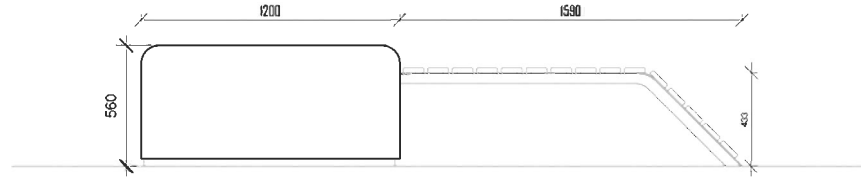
WAITING BENCH AND BULKHEAD
